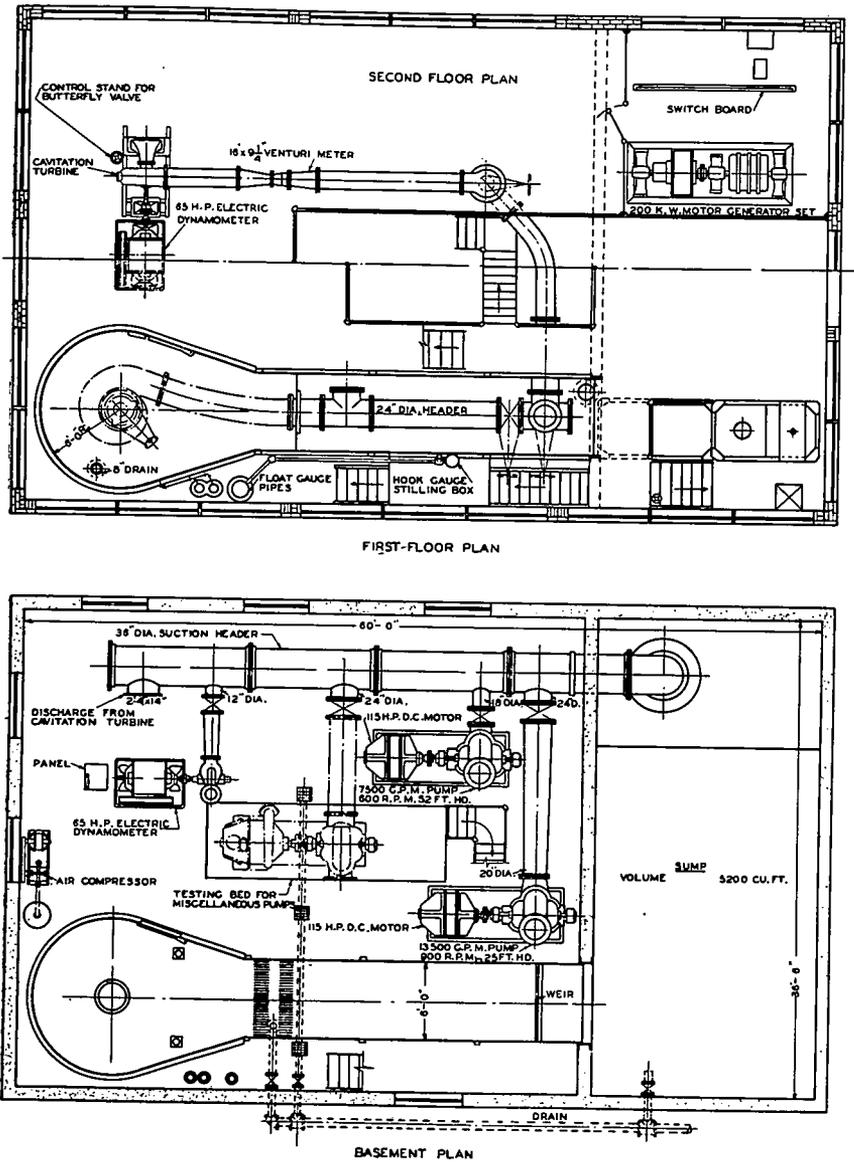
THE NEWPORT NEWS SHIPBUILDING AND DRY DOCK COMPANY, NEWPORT NEWS, VA. — PLAN OF LABORATORY
